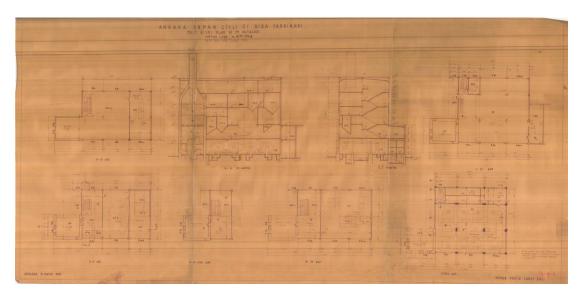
The revised drawing of the malt building which was constructed, No: 226a, Plans and sections drawn by Ernst Egli, 21.05.1937 (Source: TTA Archive)
